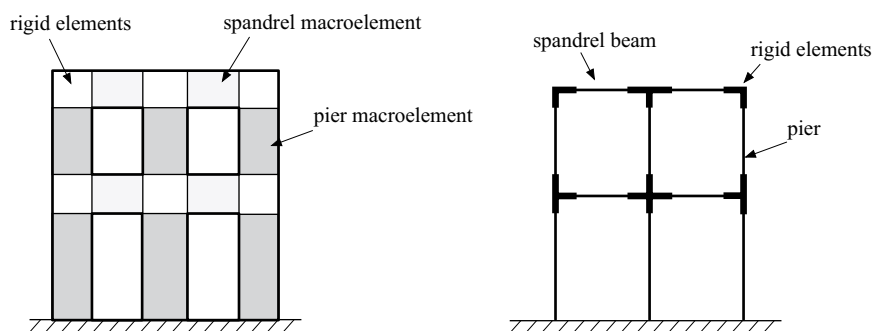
Refined model of unreinforced masonry buildings using a macroelement approach such as proposed by Brencich, Gambarotta and Lagomarsino (left) and by Magenes (right)
